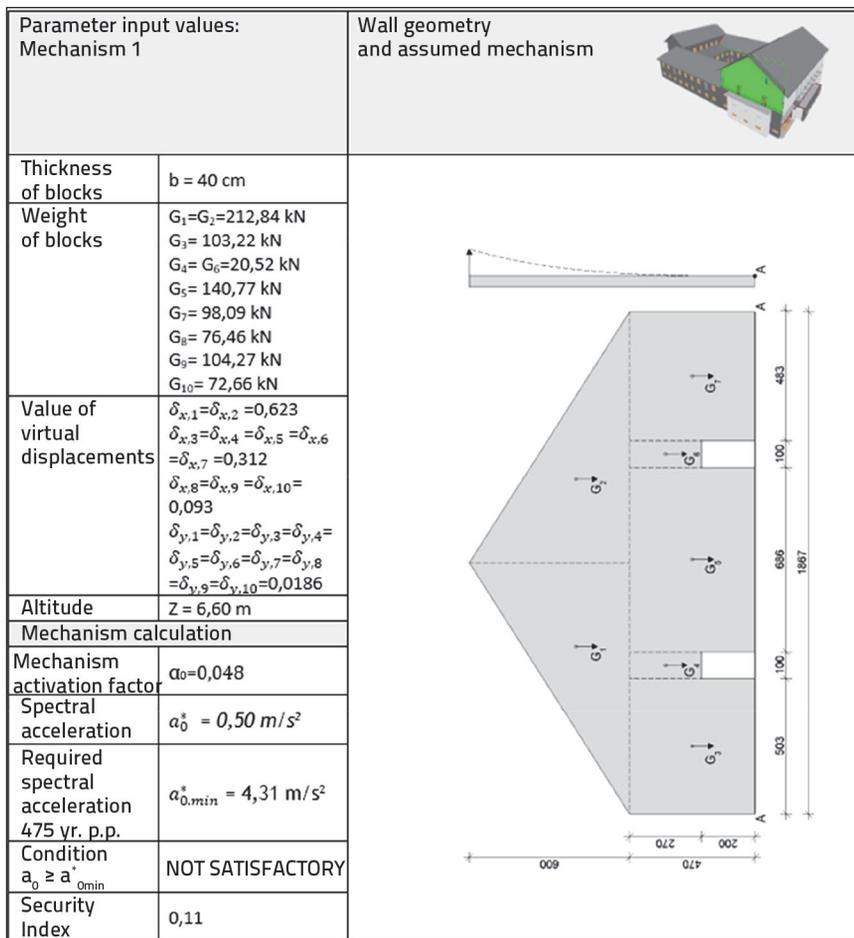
Calculation of the out-of-plane wall failure mechanism [11]
